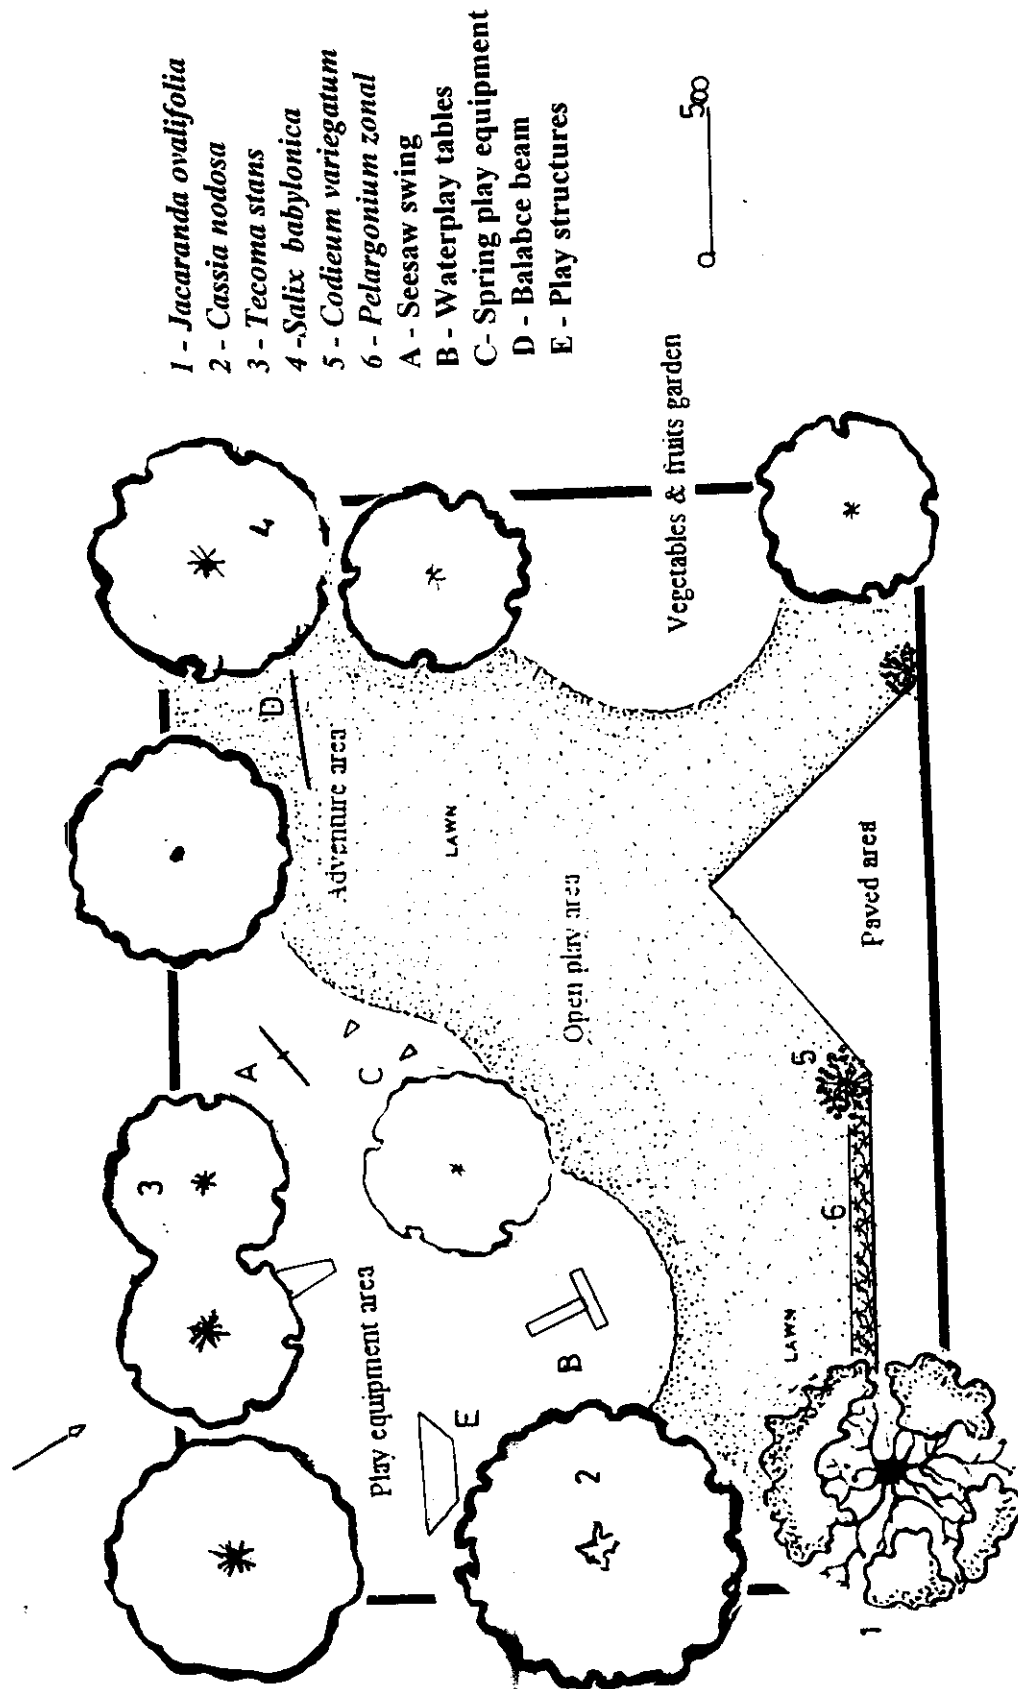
A proposed design for kindergarten garden in an area 400 m .
